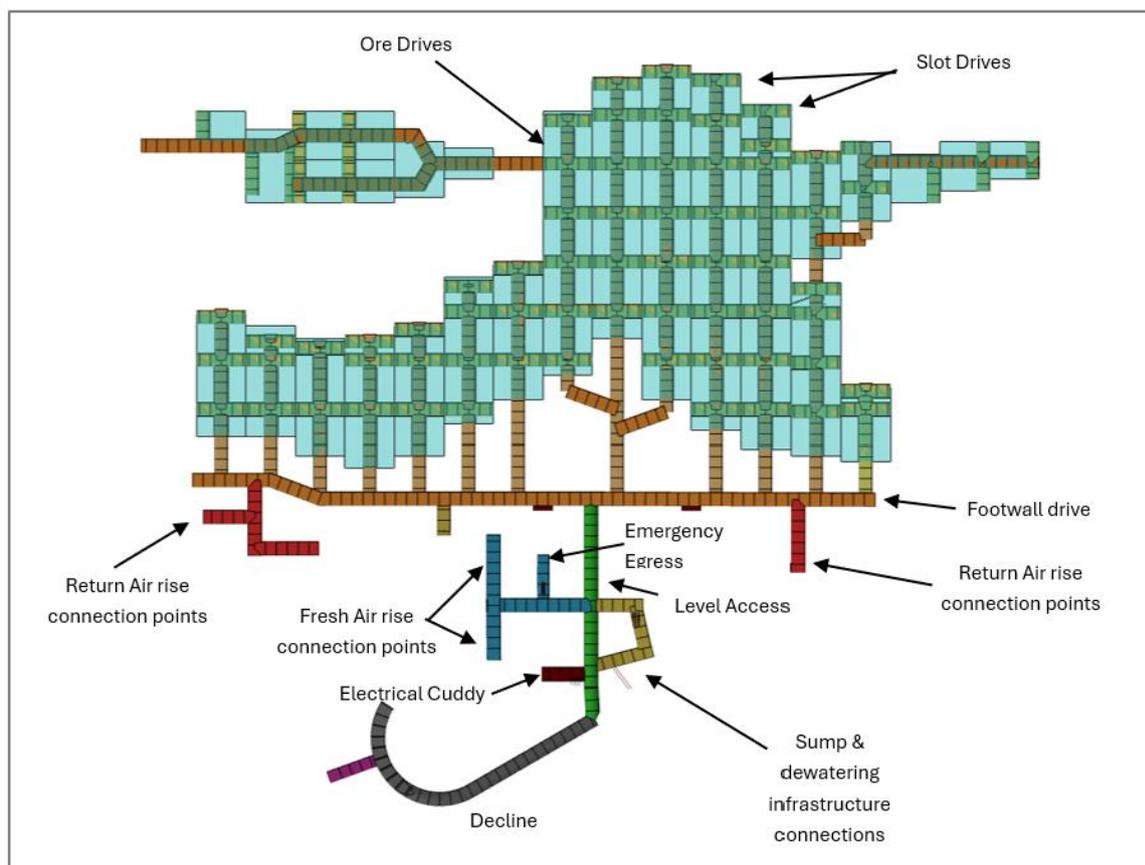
Plan View - Didipio Underground Level Layout (2100 mRL Level Plan View)
